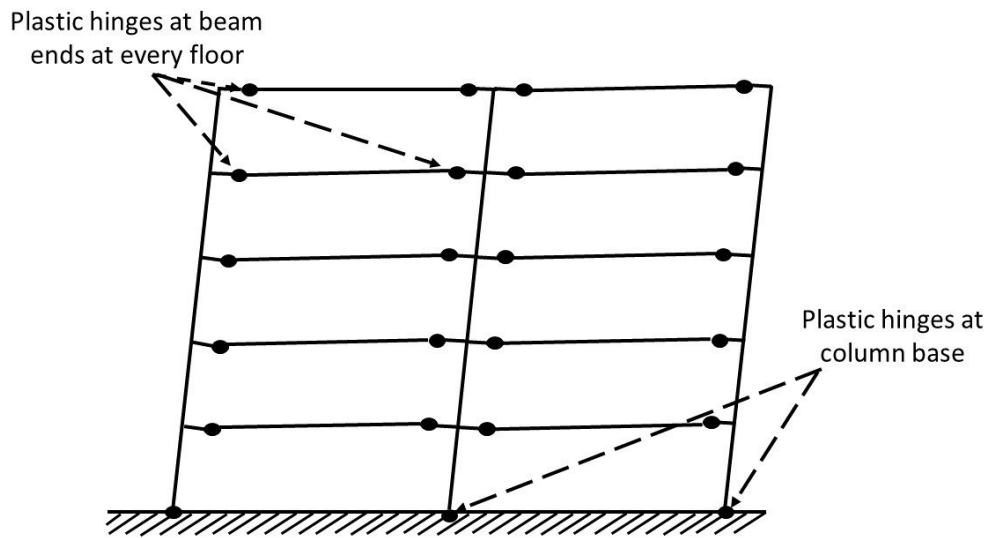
Typical layout of a moment resisting frame structure with expected plastic hinging
